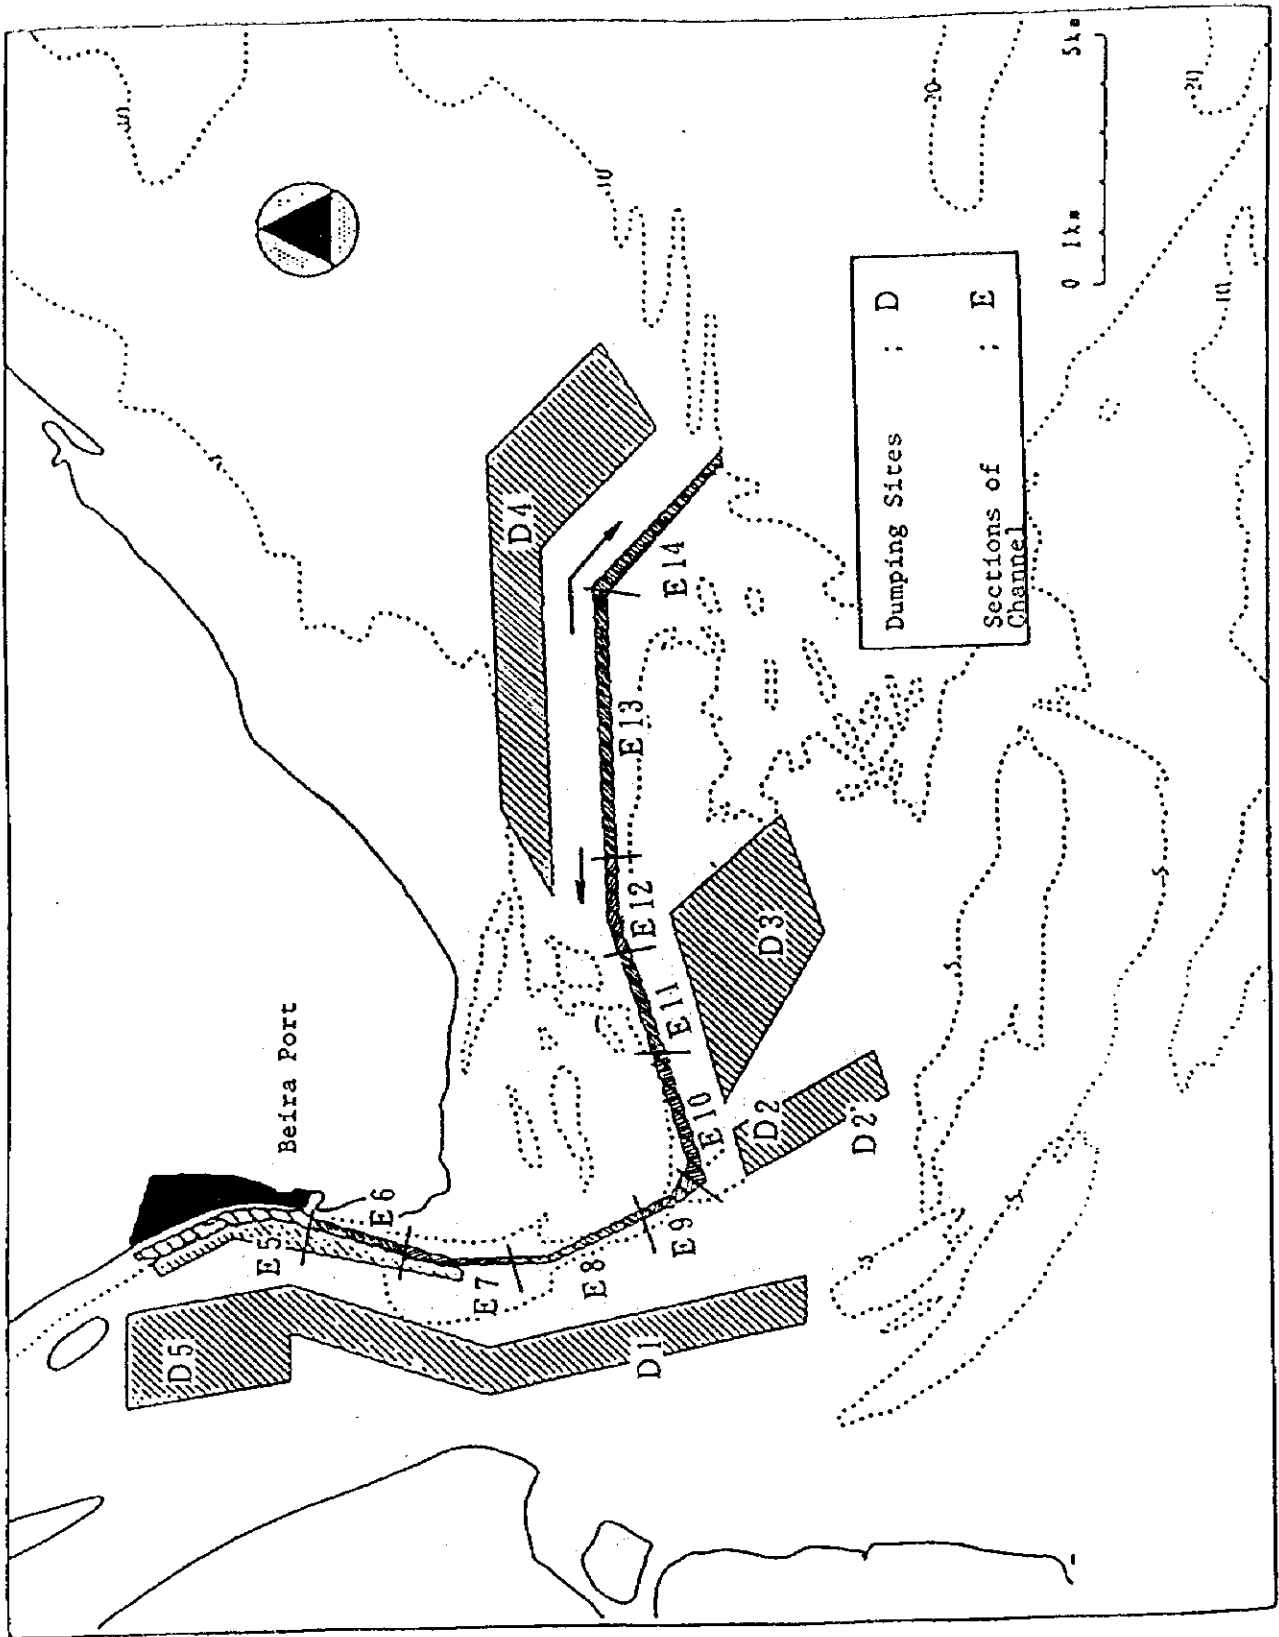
Layout of Access Channel and Dumping Sites
